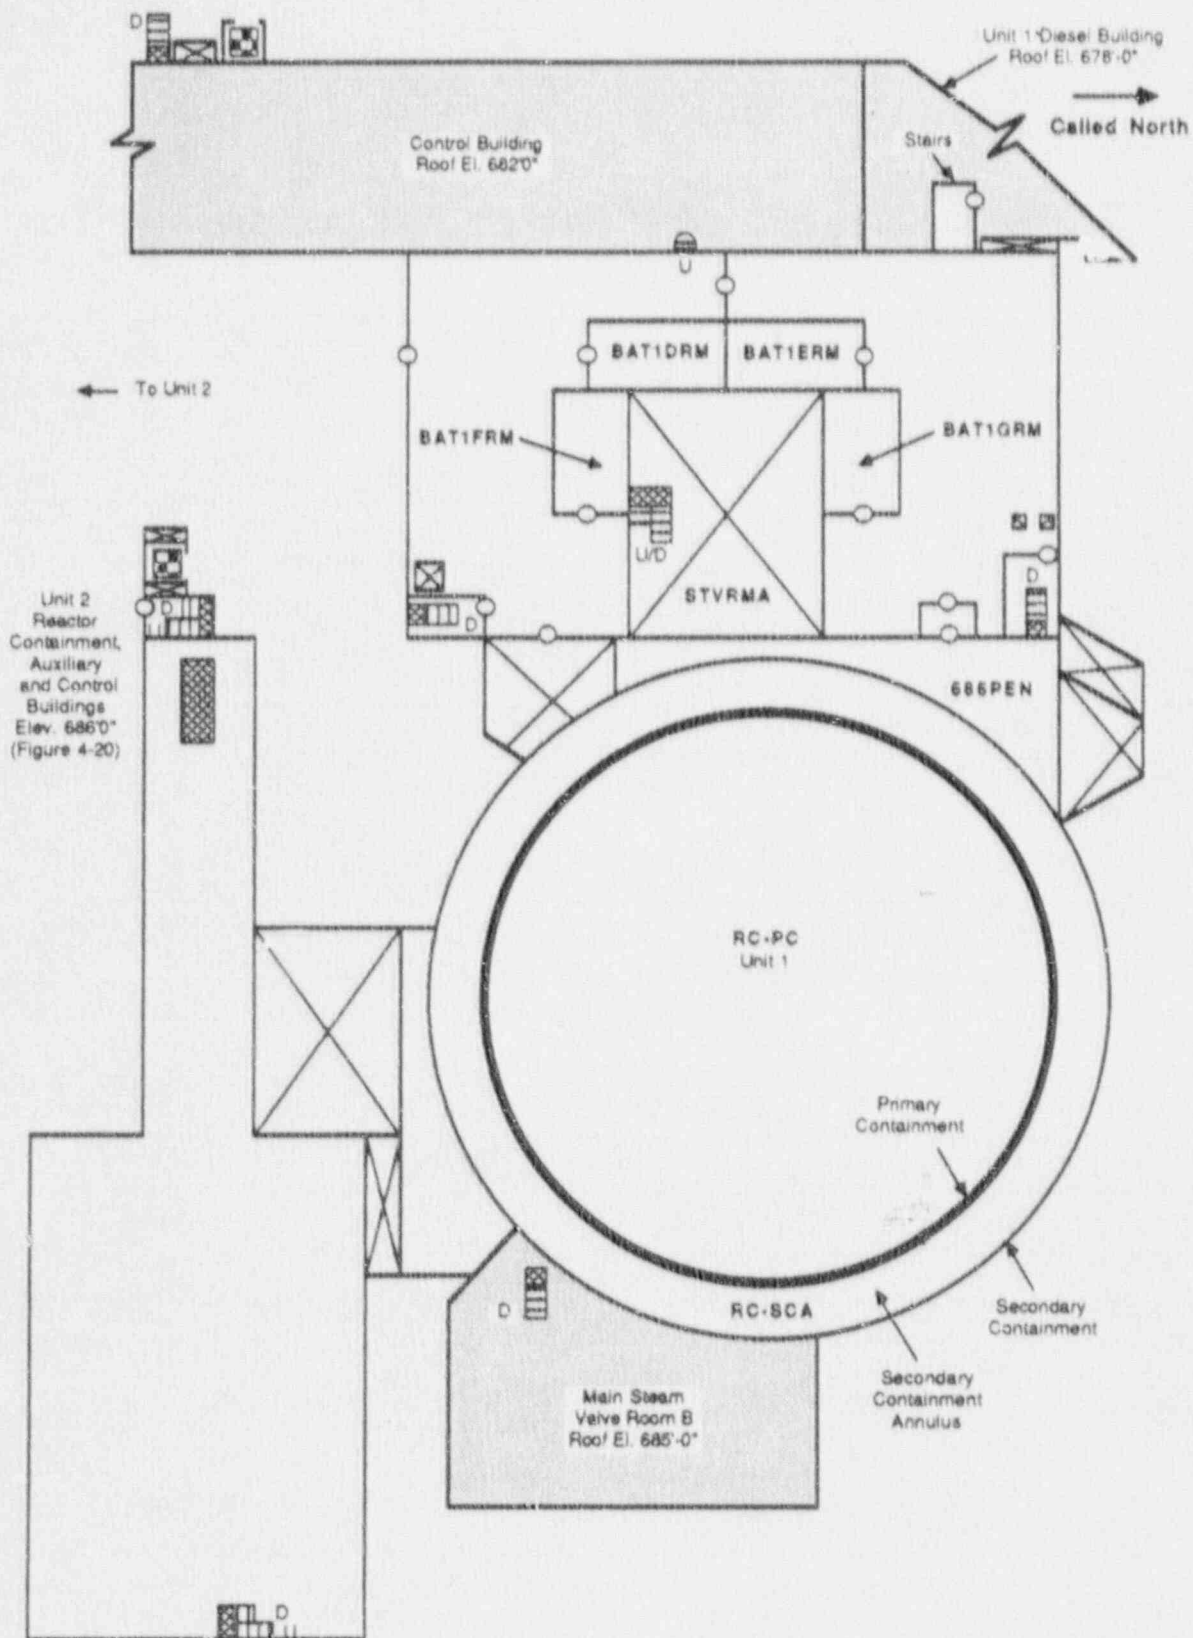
Bellefonte 1 Reactor Containment, Auxiliary and Control Buildings, Elevation 686'-0"
